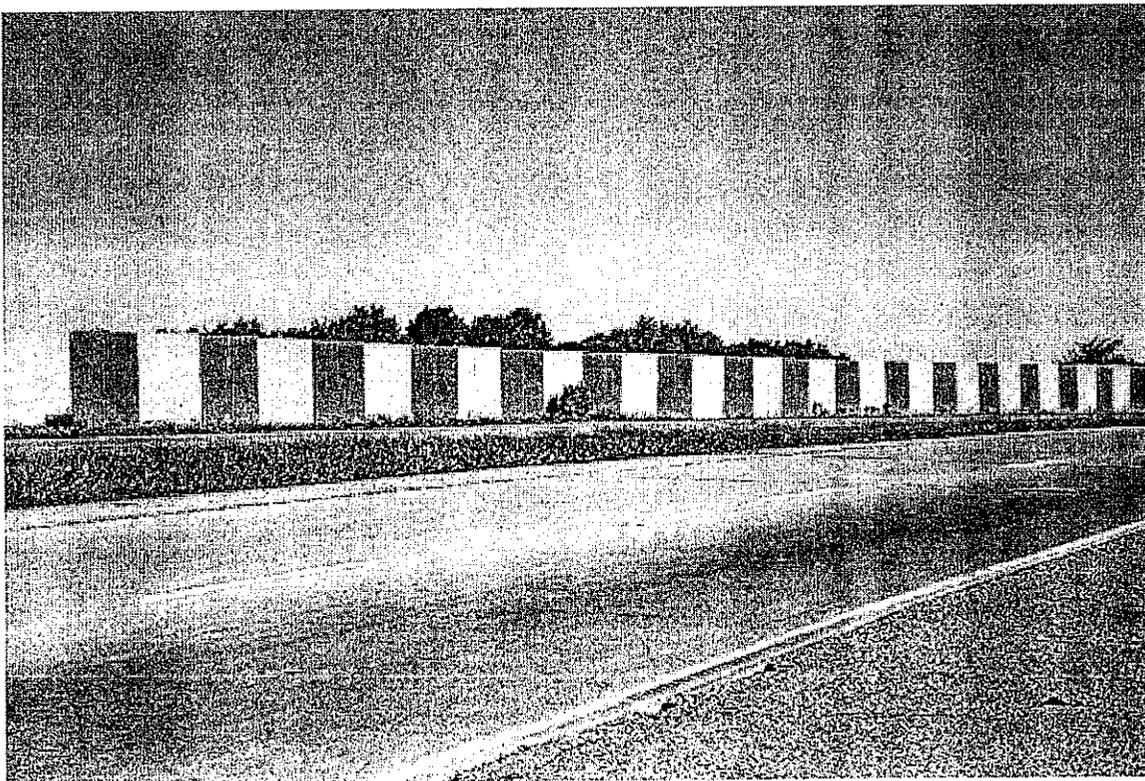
Precast/prestressed concrete barrier, I-39, Rockford.
